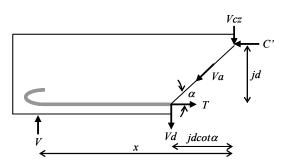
Forces within the shear span of an RC beam element without stirrups
